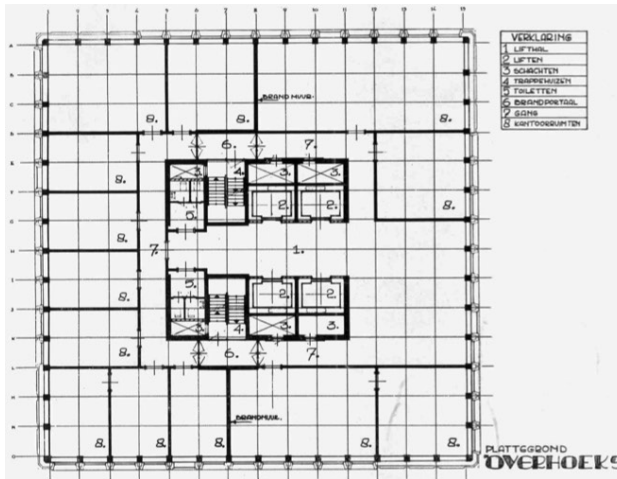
original Floor plan ([www.armisoft.nl](http://www.armisoft.nl))
